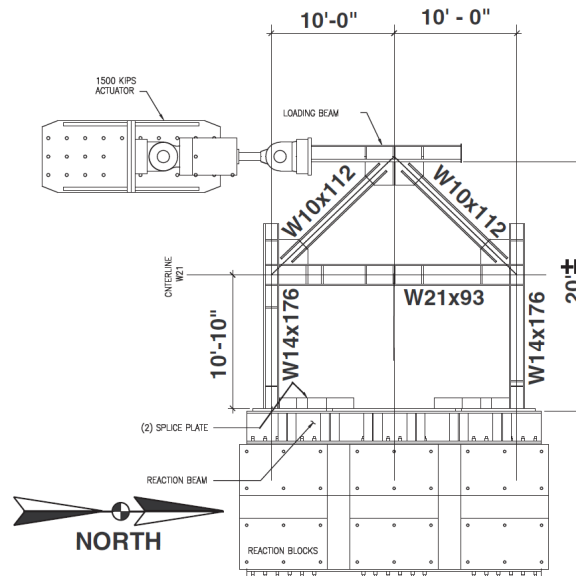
UC Berkeley tests bare frame structural drawing [49]
